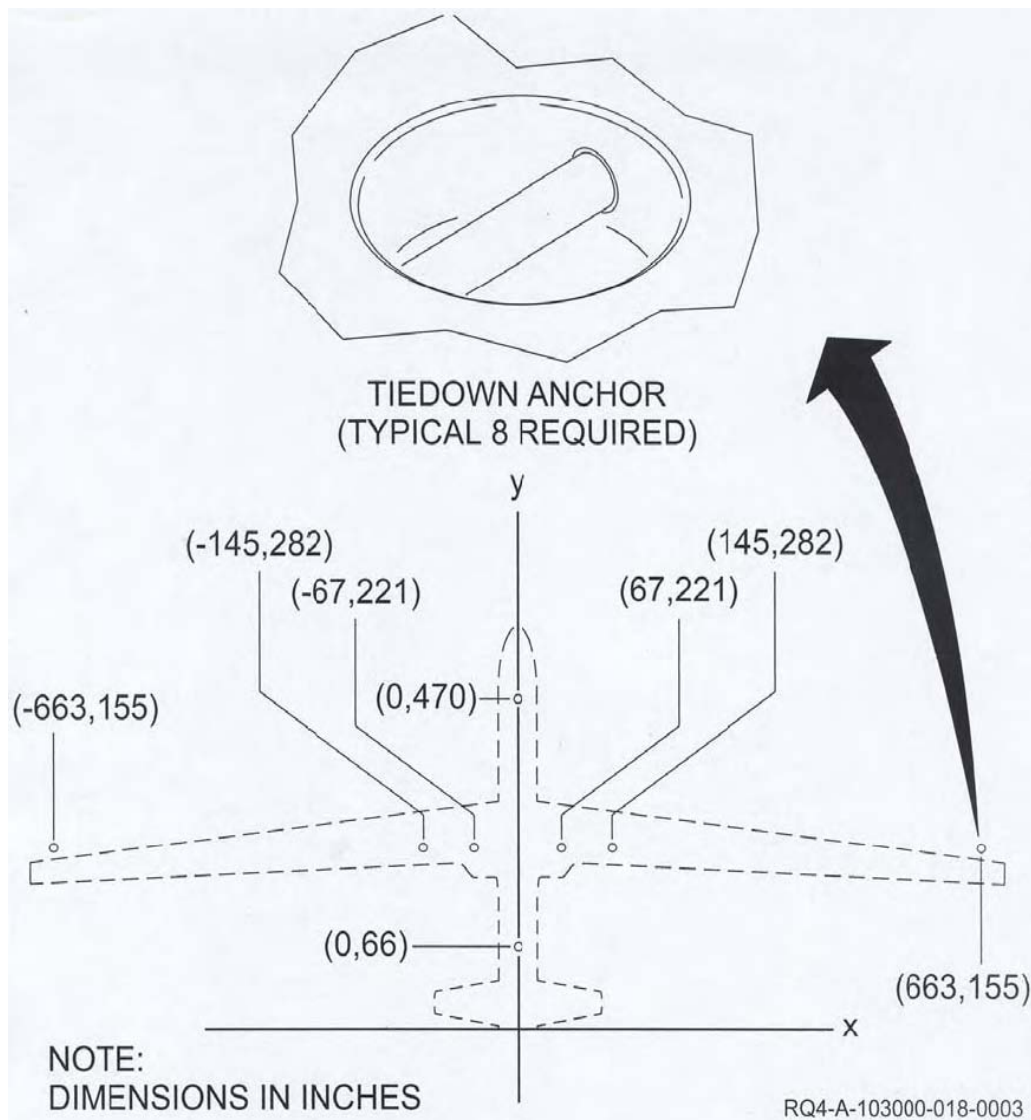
Parking Area Dimensions for RQ-4A and RQ-4B Global Hawk
